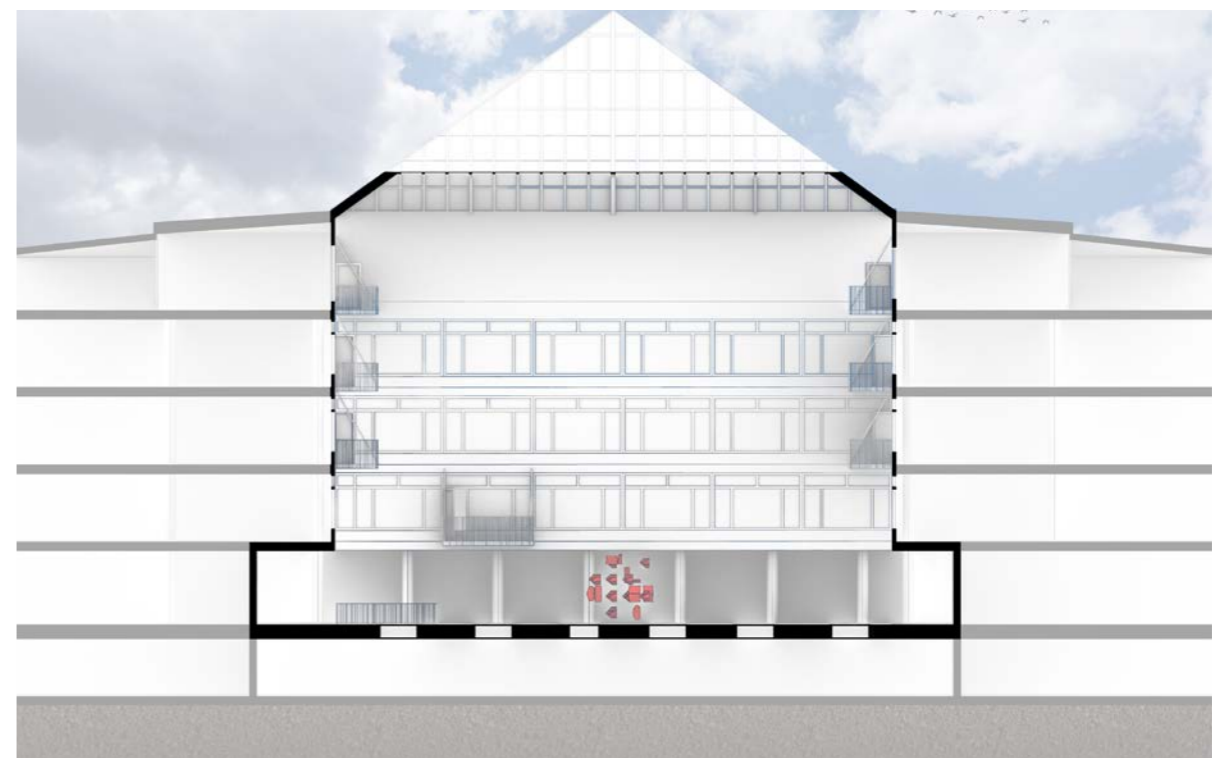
North elevation DD of Installation one and the atrium 1:350 0 4 8 12 16 20m
